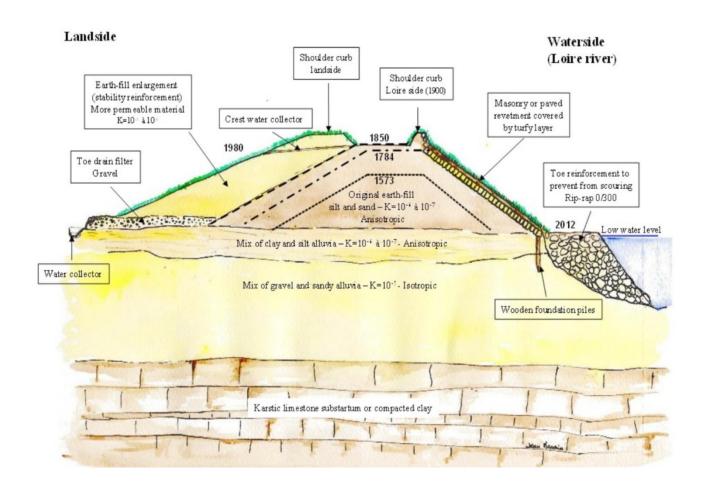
A typical Loire levee cross section in the Orléans area (source Jean Maurin)
